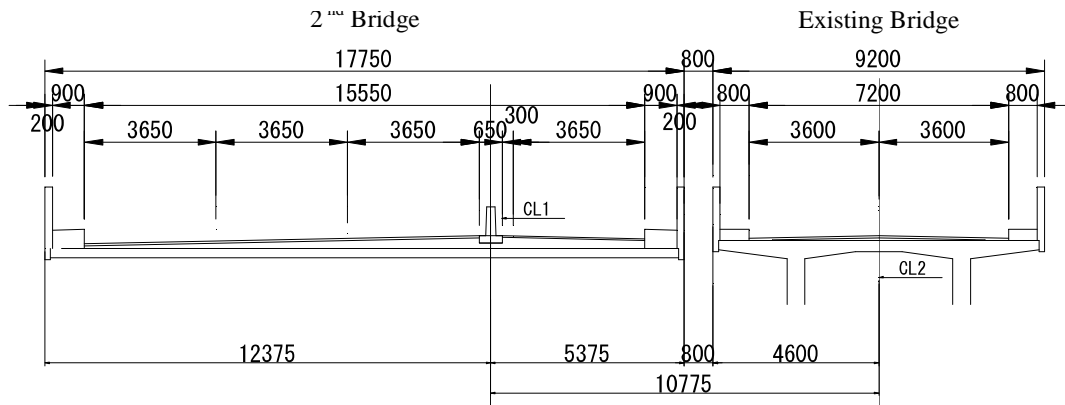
Typical Cross Section of New and Existing Meghna Bridge
